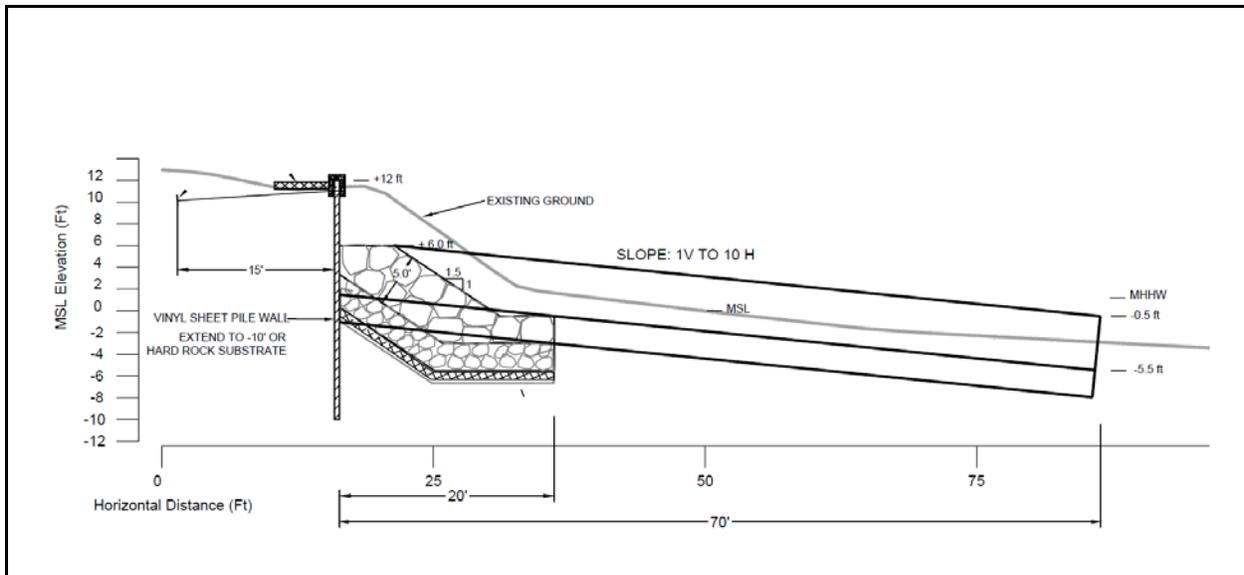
Layout of a 1 vertical to 10 horizontal revetment
